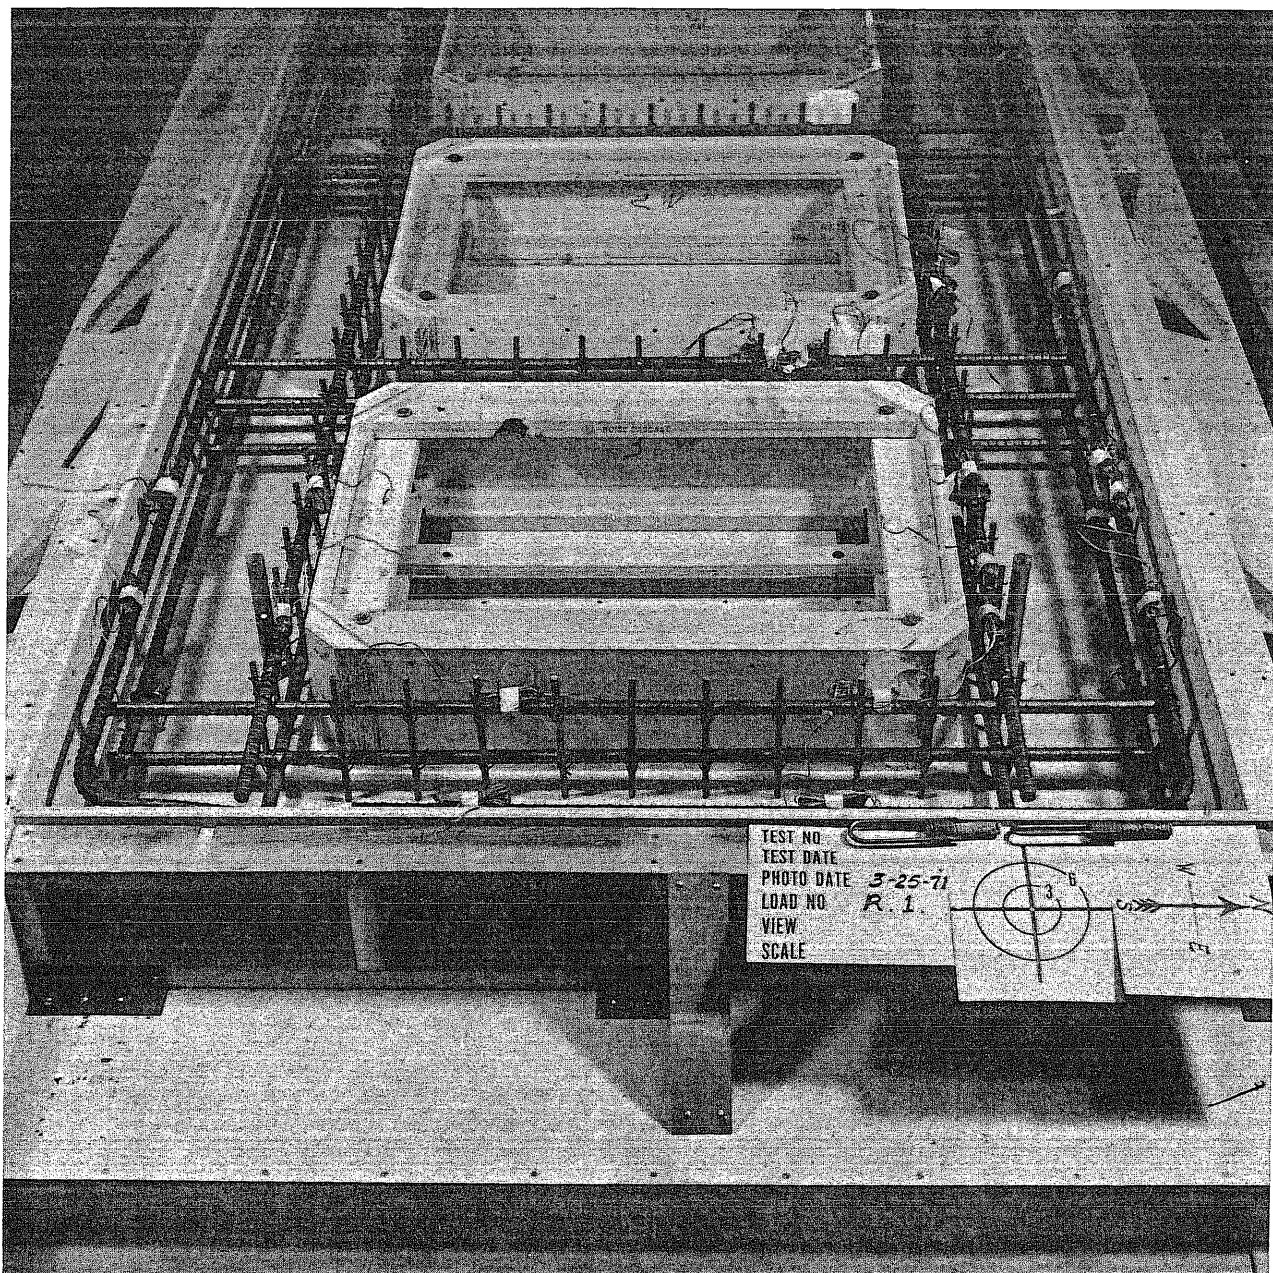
PHOTOGRAPH OF SPECIMEN R1 REINFORCEMENT IN FORMWORK
